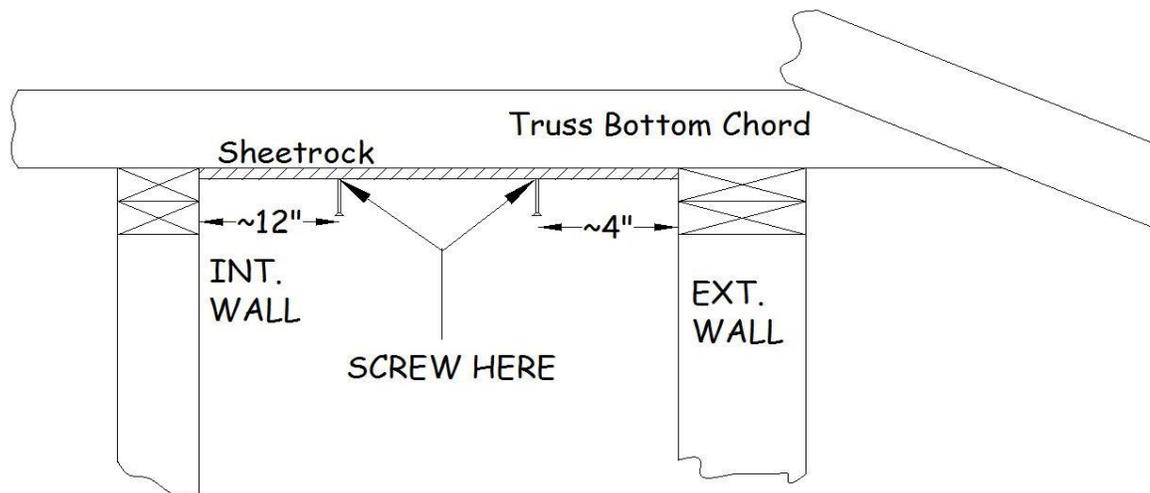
Screw Locations for Ceiling Sheetrock.
